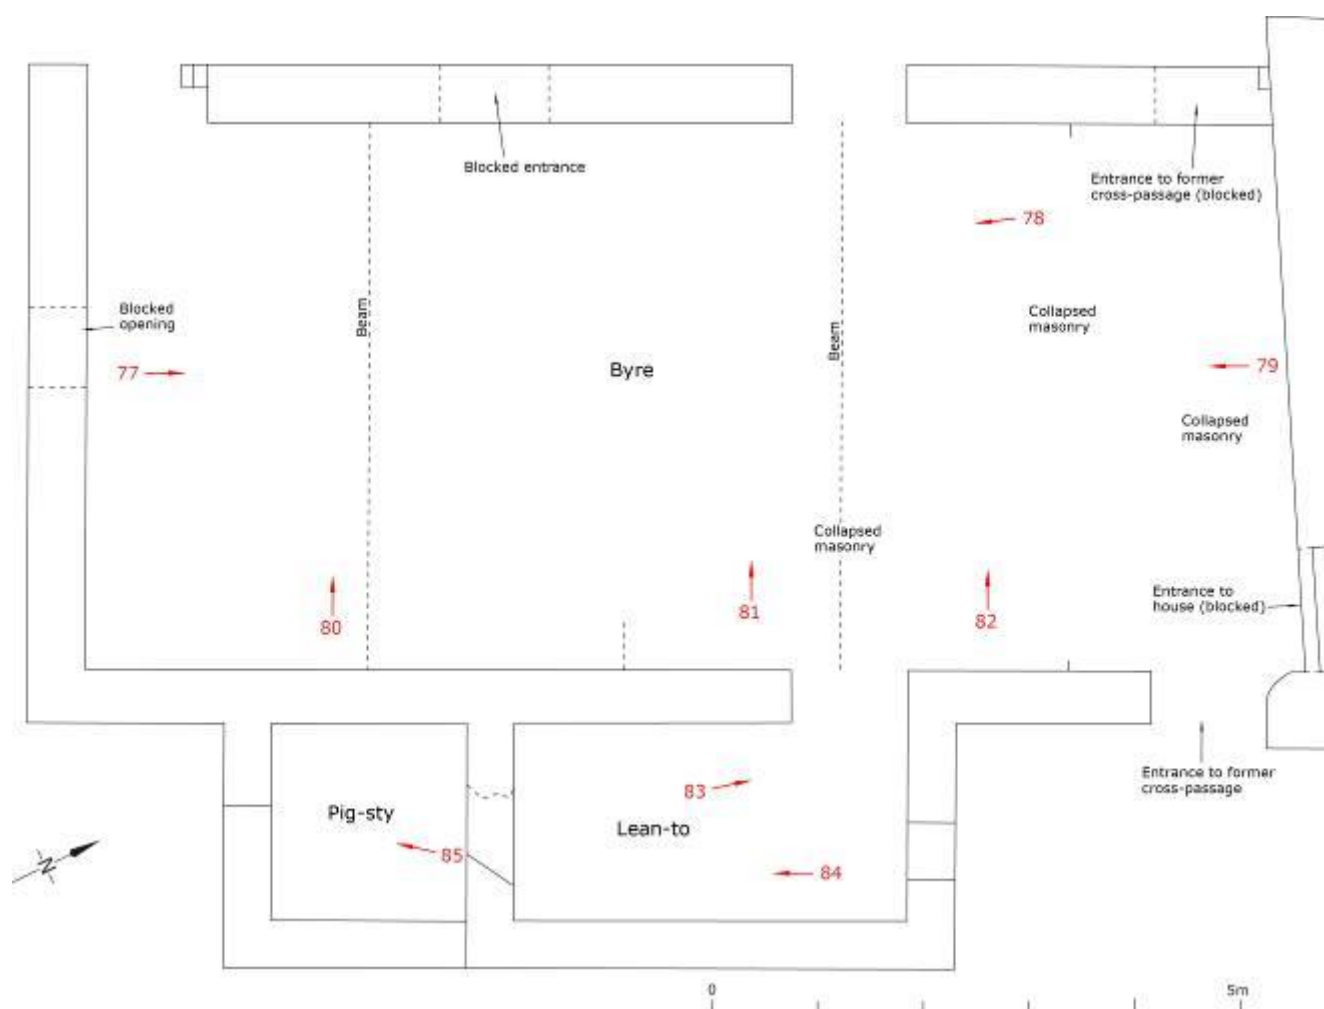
Floor plan of byre and outbuildings showing number and direction of photos
